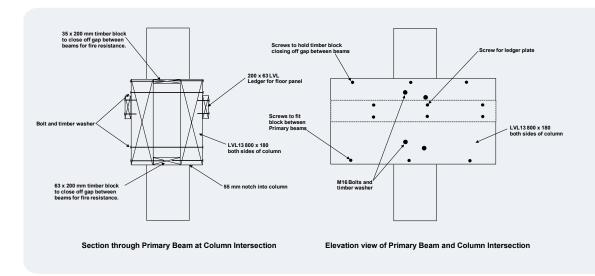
Screw and bolt fixing of beam to columns, Levels 2 to roof.
